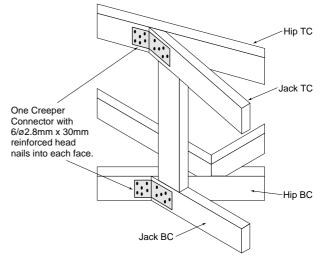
Intersection of Jack and Hip Truss to Truncated Standard Truss
